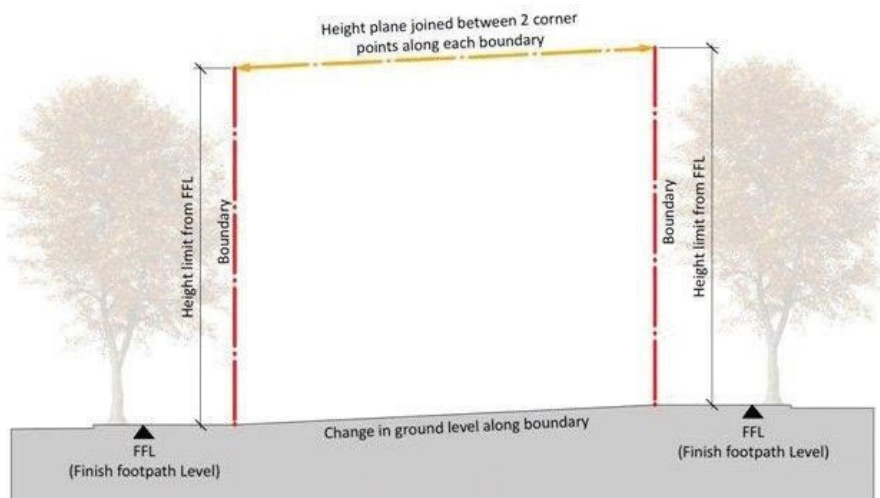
Constitution Avenue and Anzac Parade - Measurement of building height
